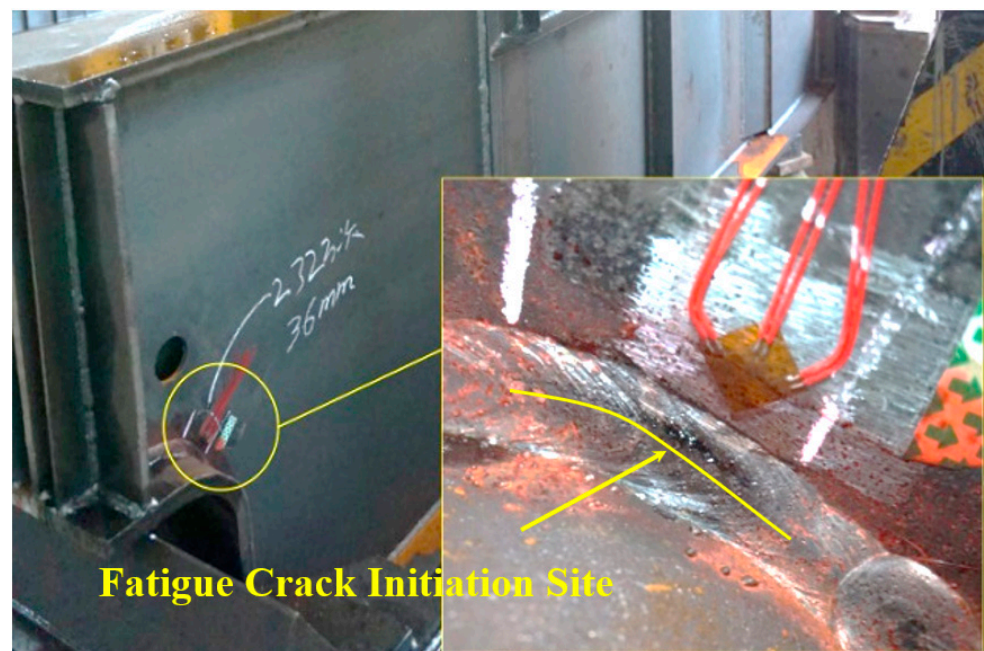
Cracks originated at the weld root and penetrated through the weld.
